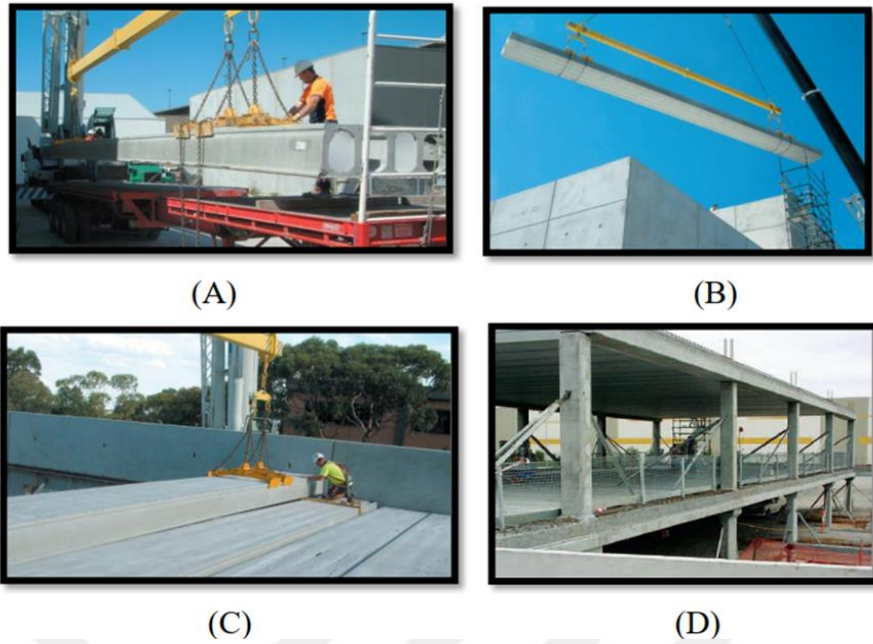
Installation Stages of Hollow Core Slabs in Site
